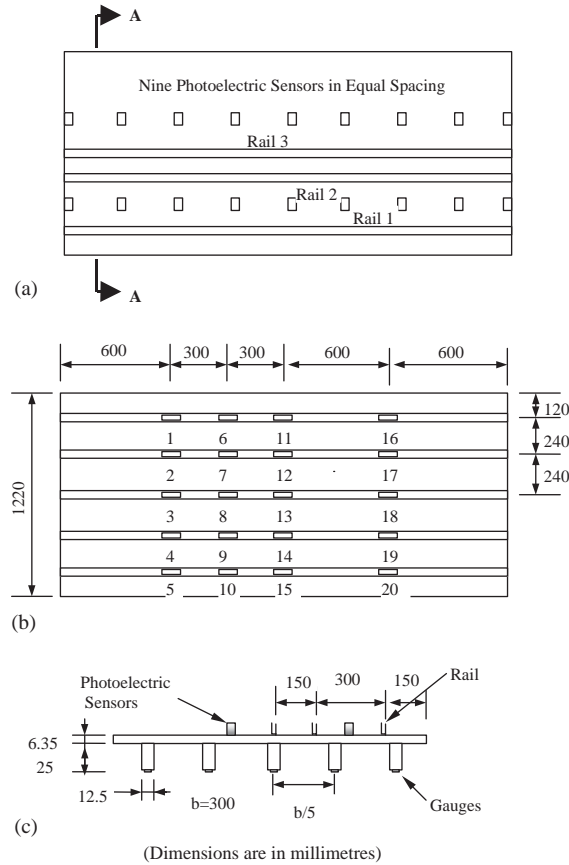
Layout of the bridge deck. (a) Top face of the bridge deck, (b) bottom face of the bridge deck and (c) section A-A.
